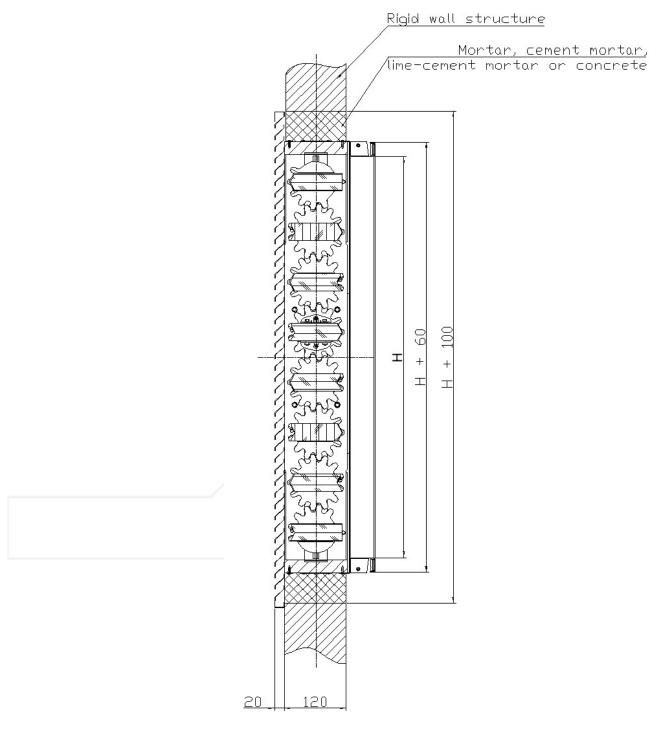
Installing method of WKP-O fire dampers in rigid wall with KST grille in rigid wall structure.
